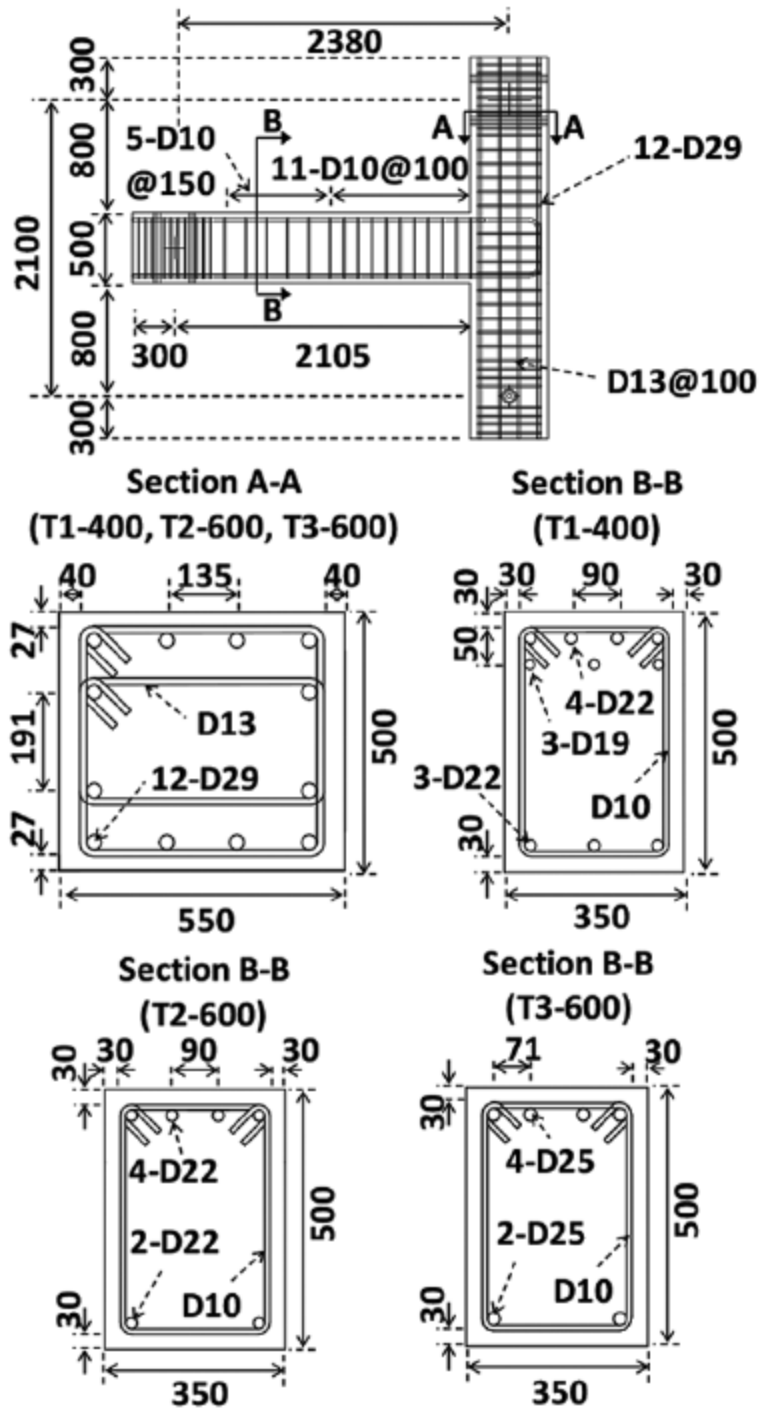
Detail of exterior beam-column joint specimens (Hwang et al. 2014)
